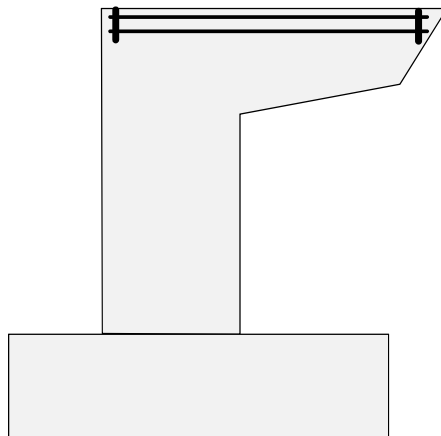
Example of Reinforced Concrete Bent with Fully Post-Tensioned Overhang
